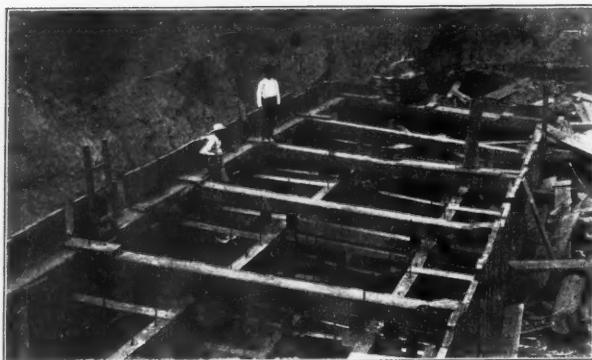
Cofferdam for Pier 5, Showing Spacing of Corrugated Bars.
